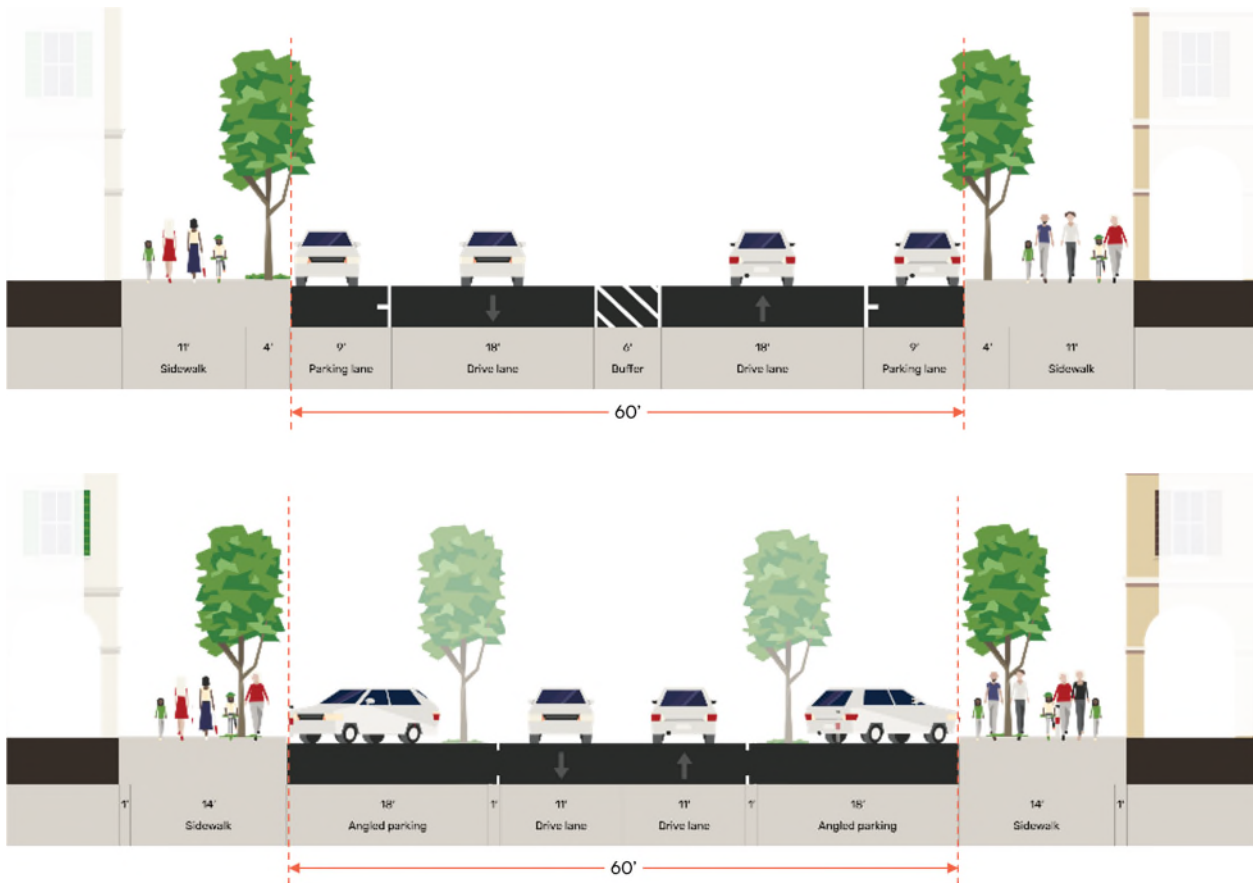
Existing and Proposed Nichols Road (please note that angled parking will be on south side only)
